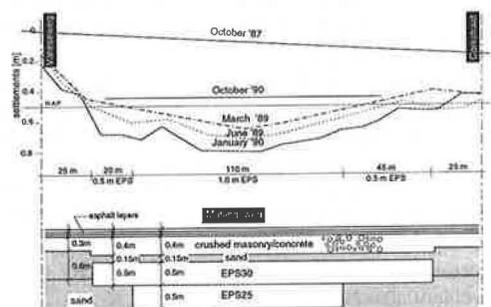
Previously obtained settlements and longitudinal profiles of the Matlingeweg.
